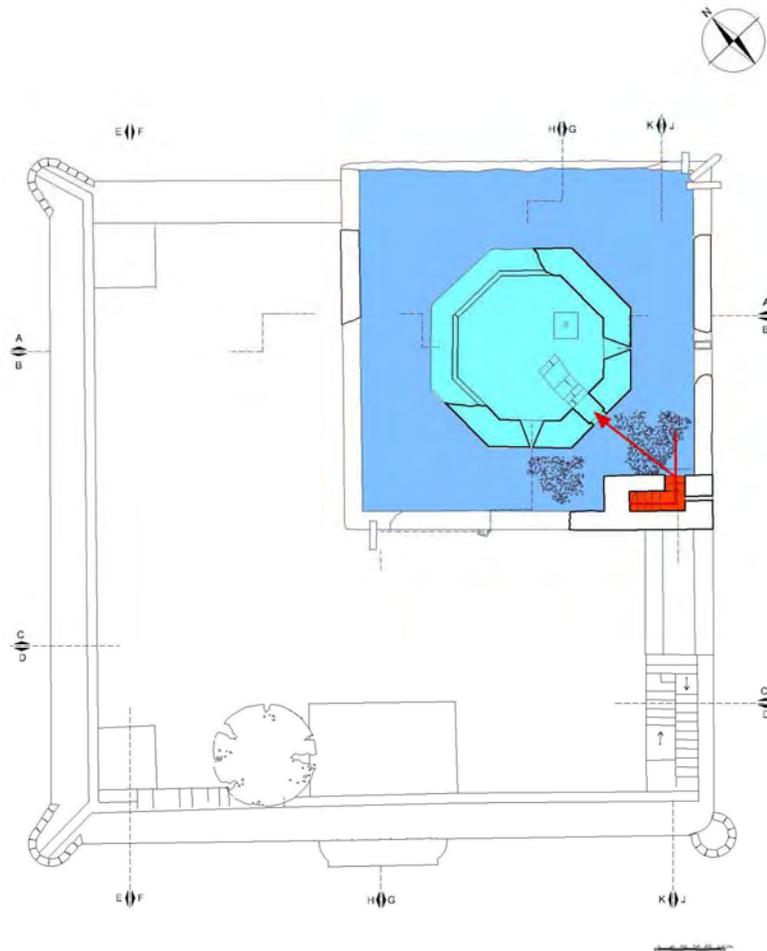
Types of Spaces and Circulation Layout- 2<sup>nd</sup> Floor Plan.
